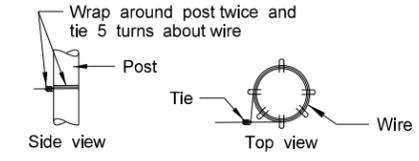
DETAIL FOR TYING FENCE TO WINGS OF ABUTMENTS
